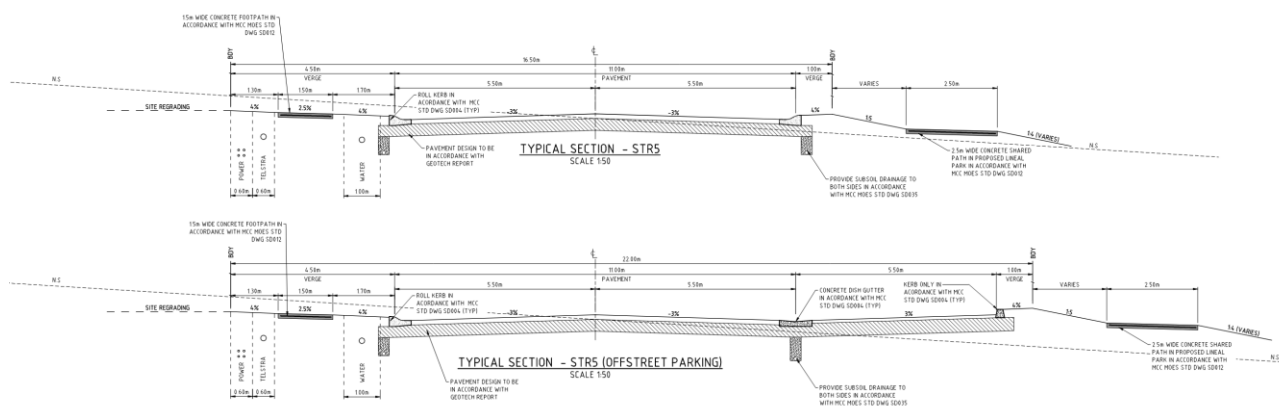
Proposed Typical Cross Section of Green Street (Source: GCA Engineering Solutions, Note: NOT TO SCALE in this Report)
